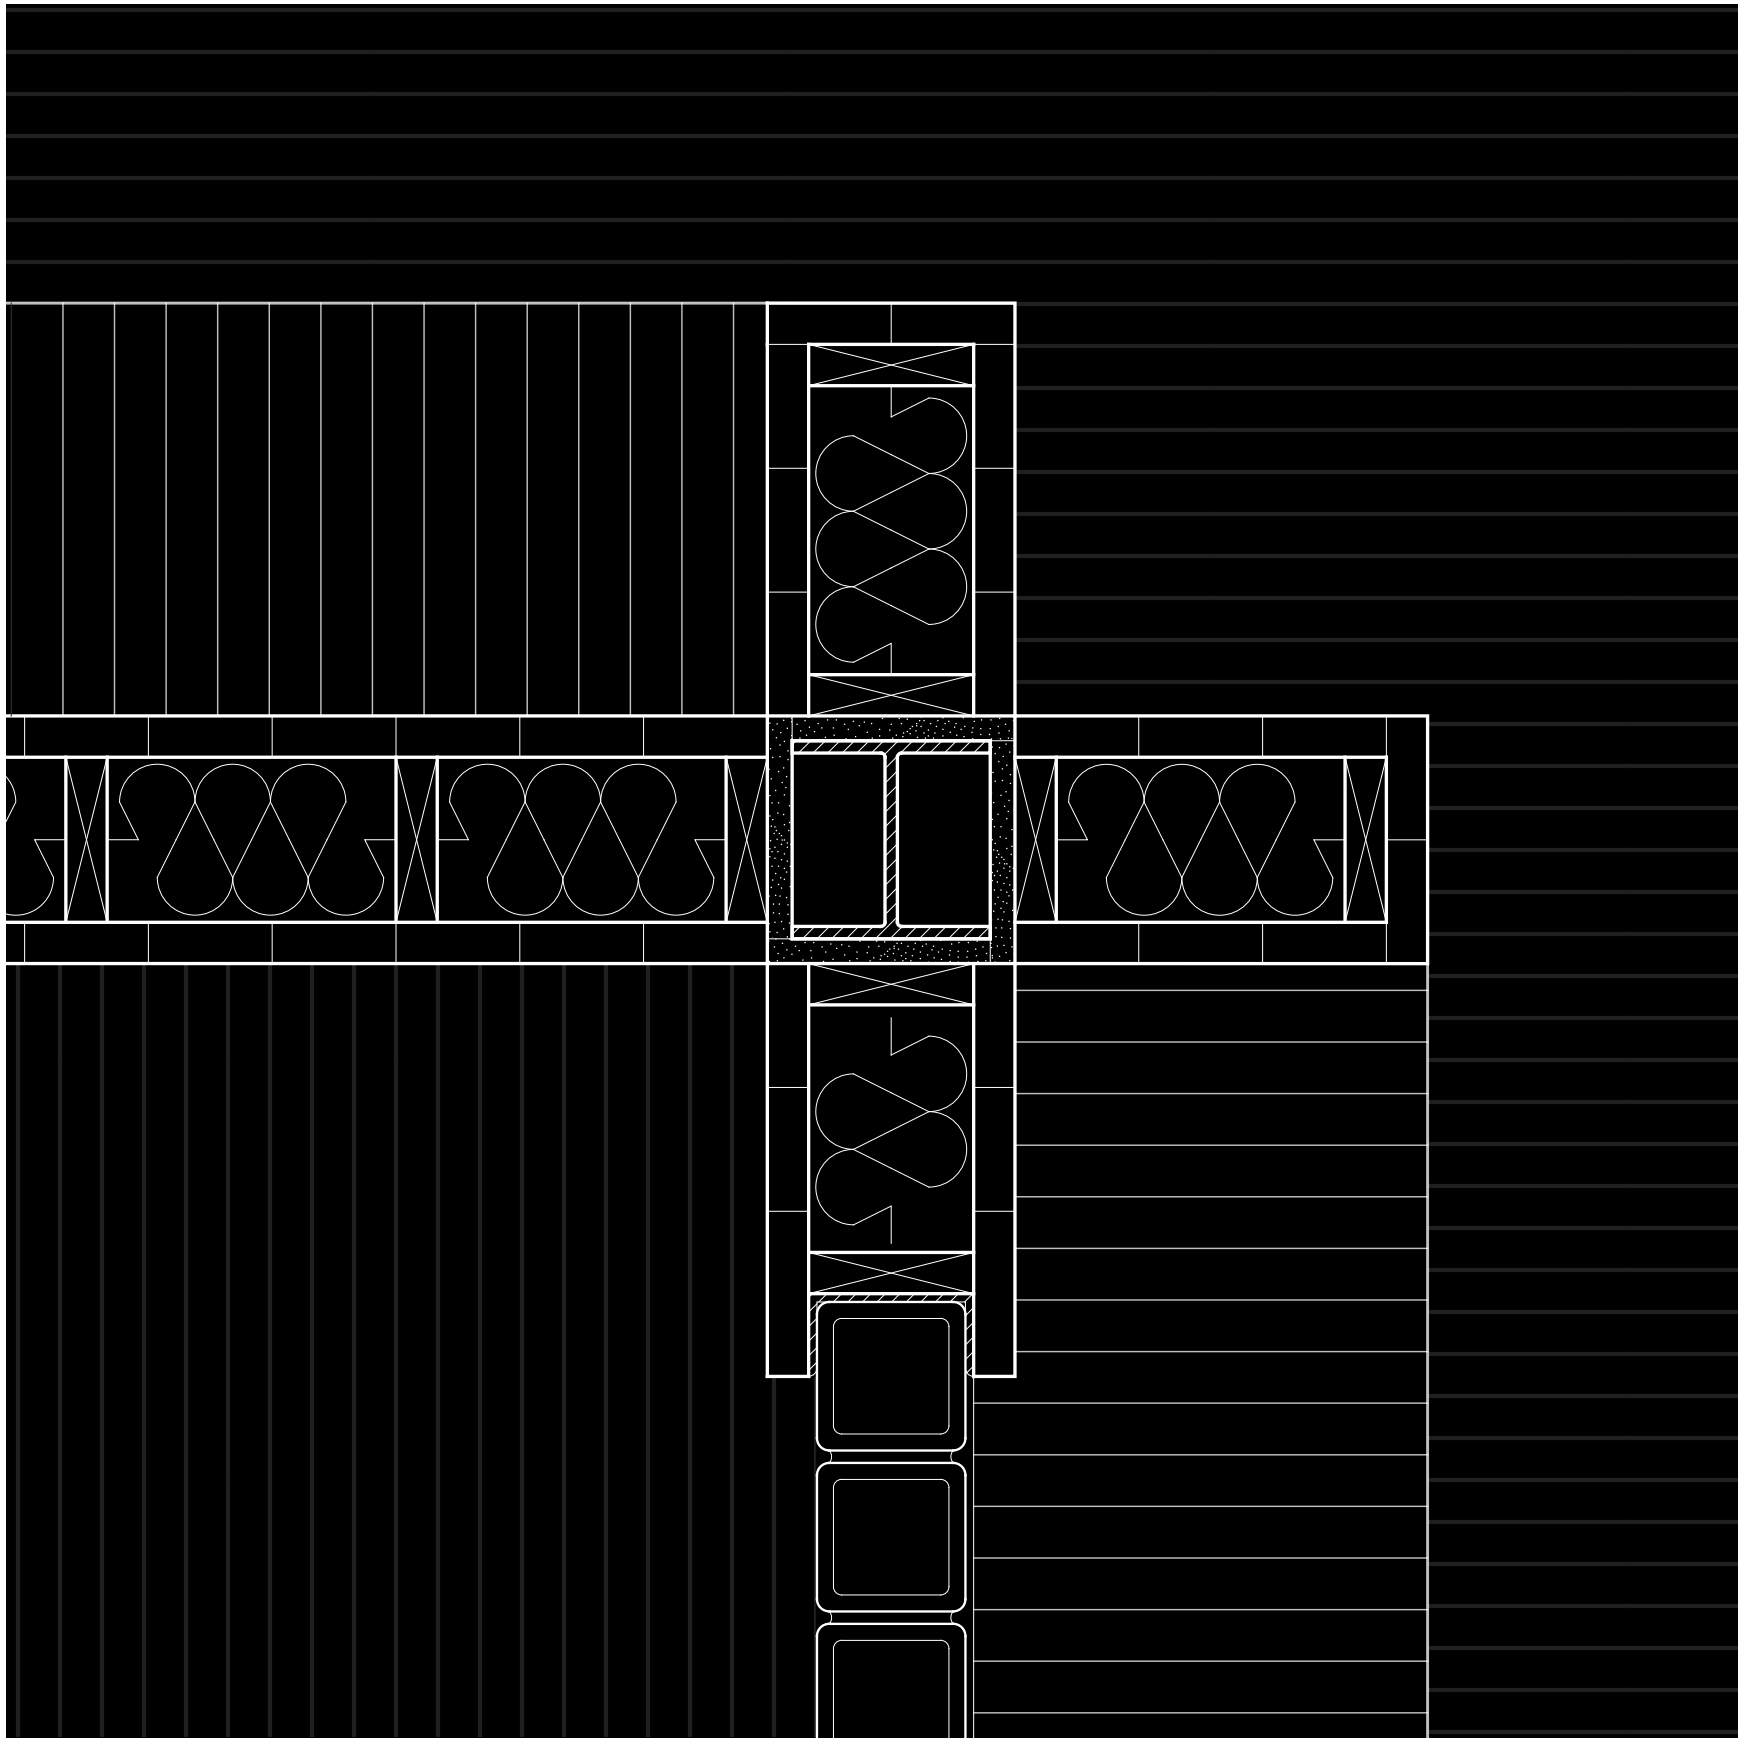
Detail Drawing Highlighting The Primary Structural Steel Column and the Flexible Surrounding Walls.
